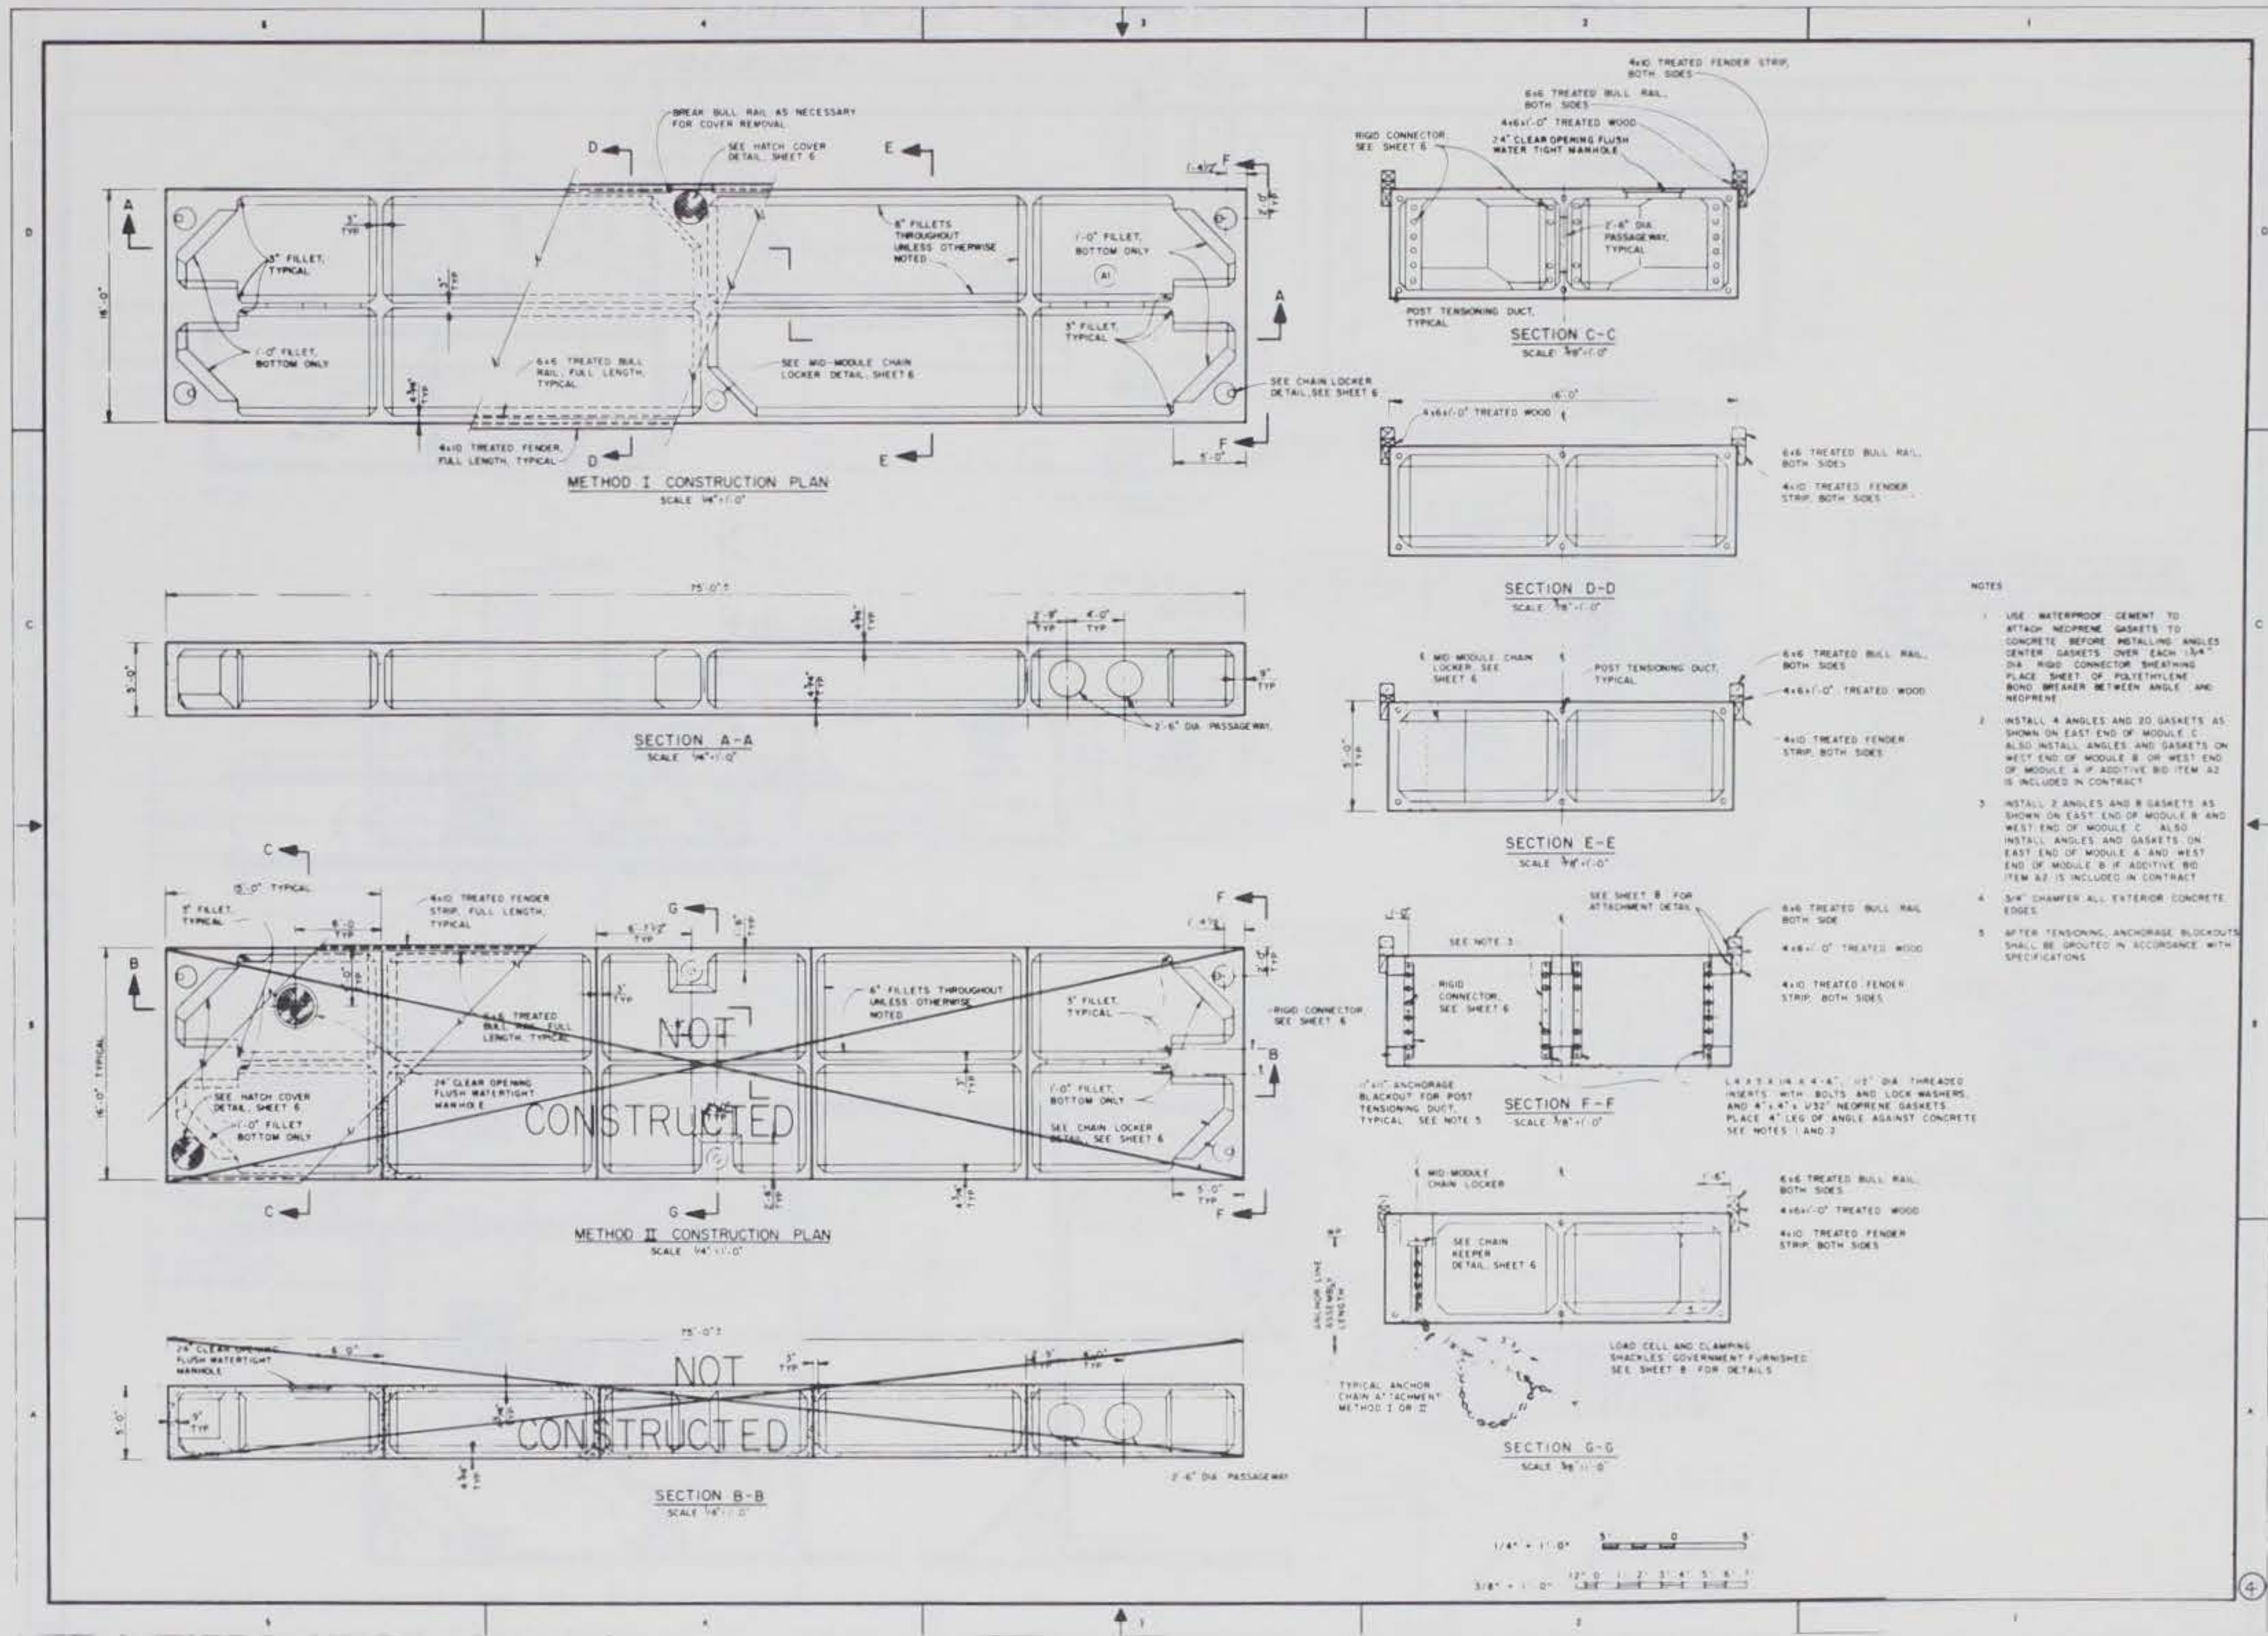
Concrete Breakwater Module, Plans and Sections
